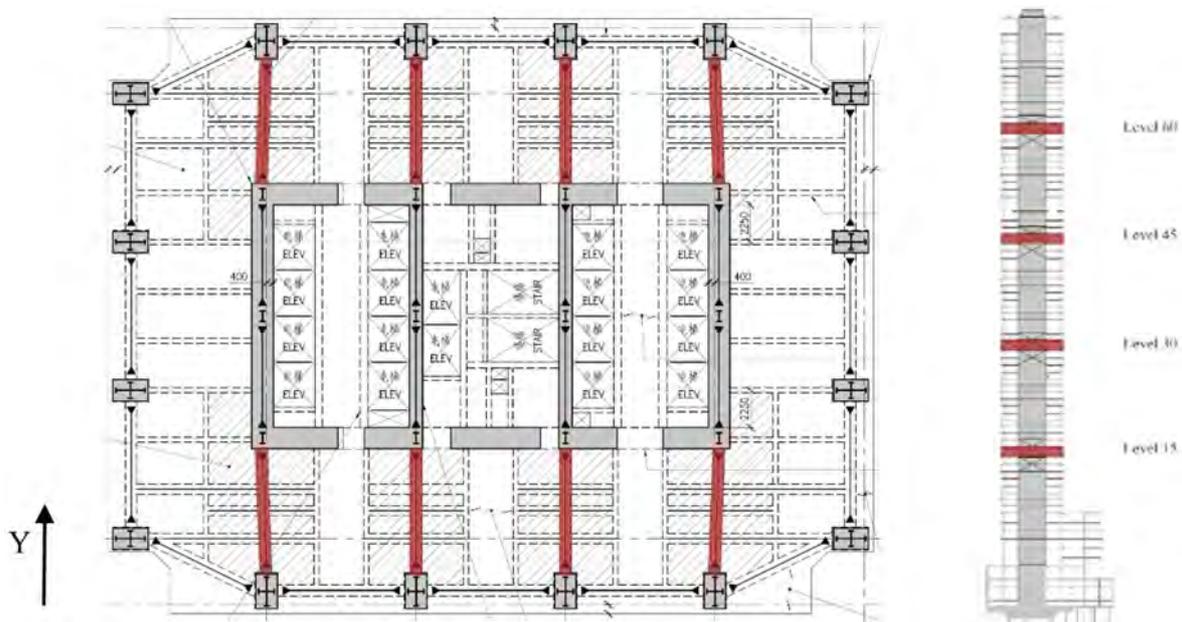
Typical outrigger floor and section of the example structure (position of the outriggers/dampers shown in red).
